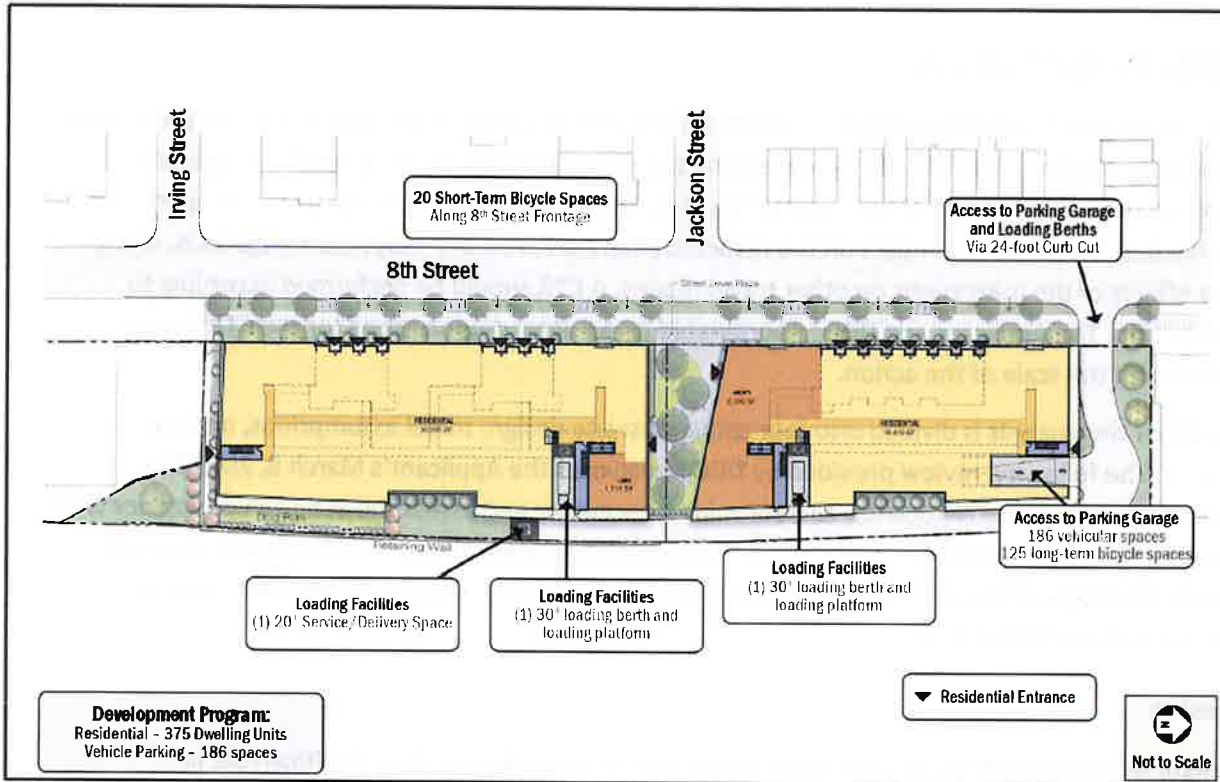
Site Plan (Source: CTR, Gorove/Slade, Figure 7, 3/8/19)
